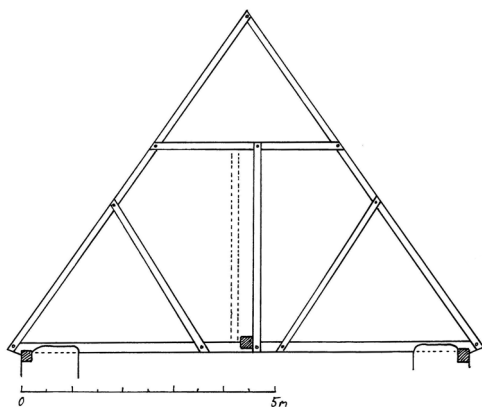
Section of the roofing above the nave in Bredestad. A collar-beam roof truss with suspended beam, which shift position from side to side of a centred steering beam. Drawing by R. Gullbrandsson.
